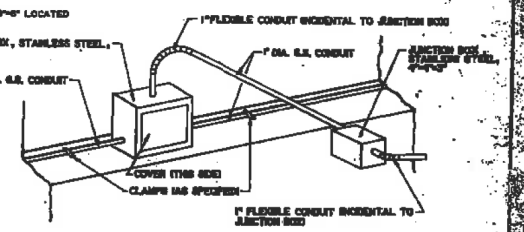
DETAIL FOR THE CONDUIT ATTACHED TO THE STRUCTURE
